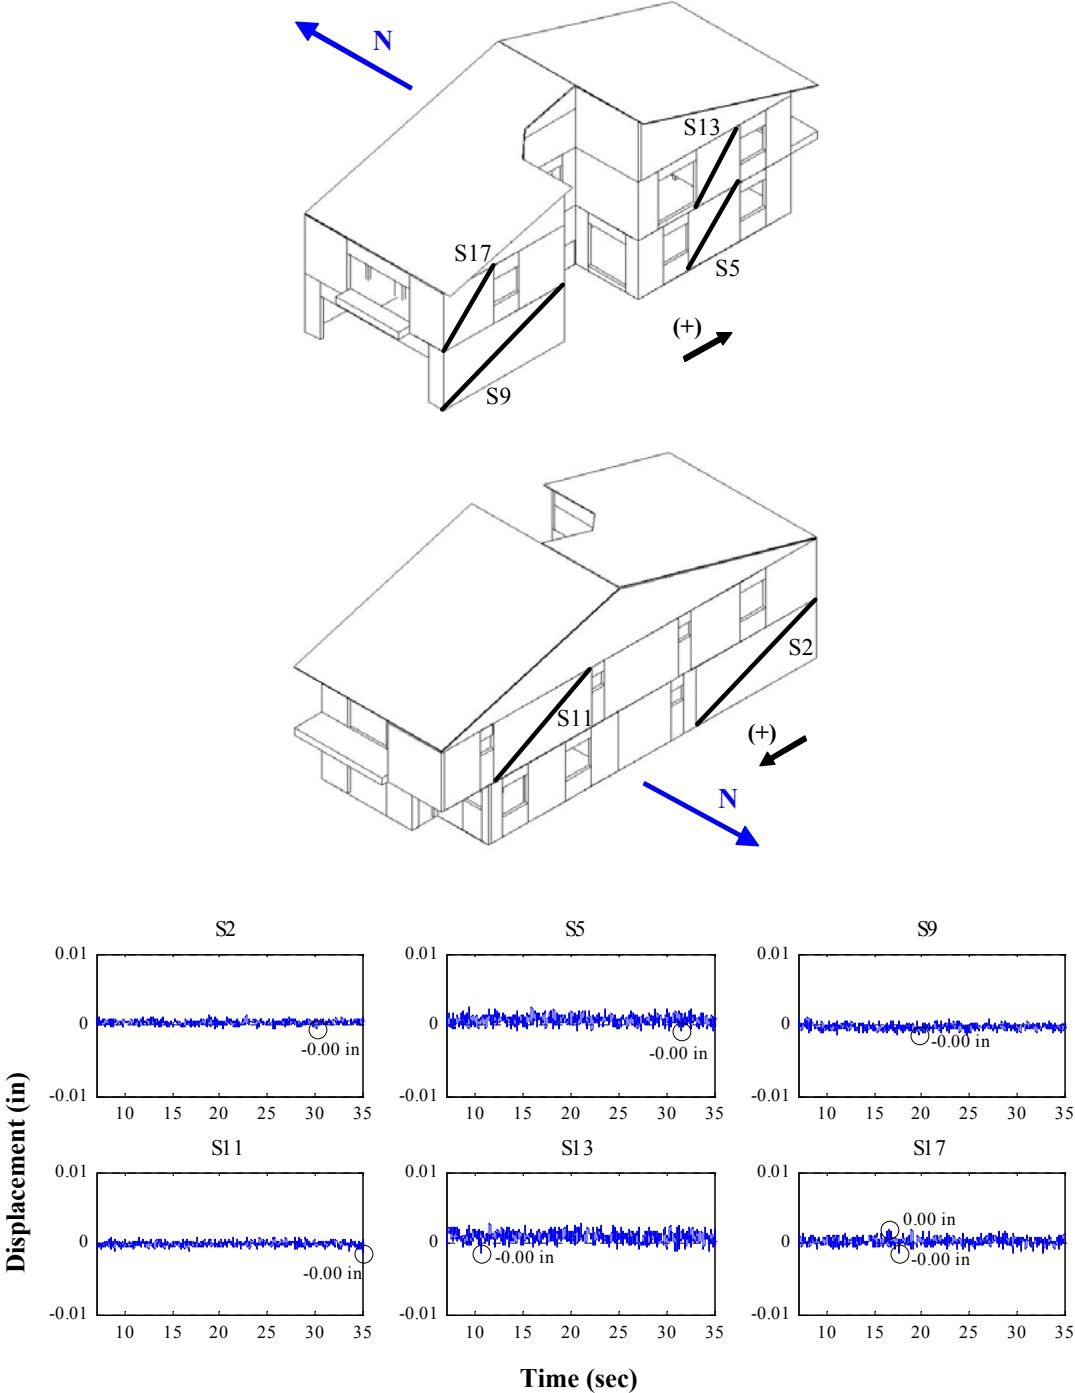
Wall deformations of east-west external walls for Test NWP1S04
